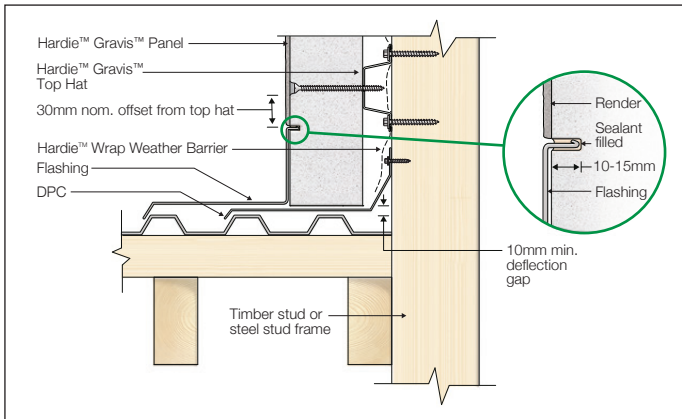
ROOF DETAIL WITH FLASHING SET INTO PANEL
